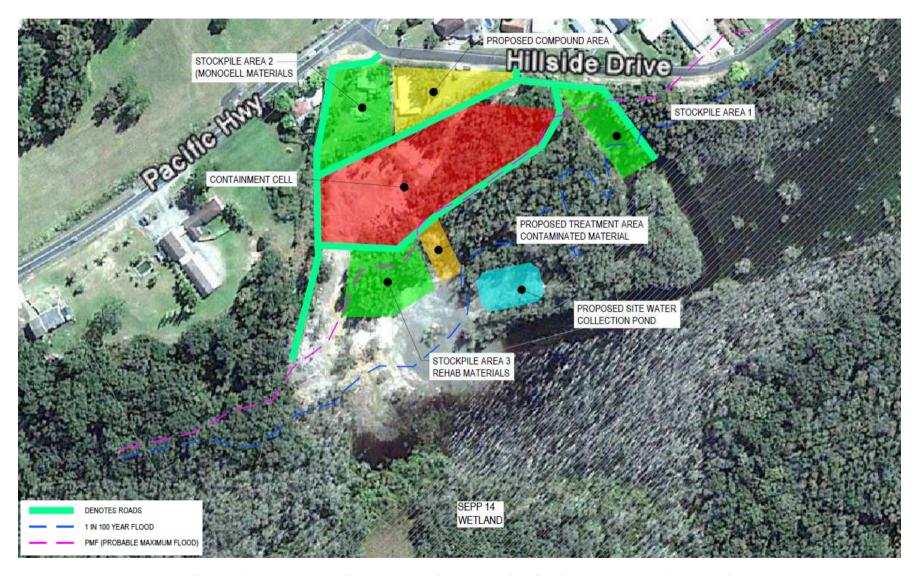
Proposed Works - Treatment Area, Containment Cell, Site Compound, Access Roads and Stockpiles
